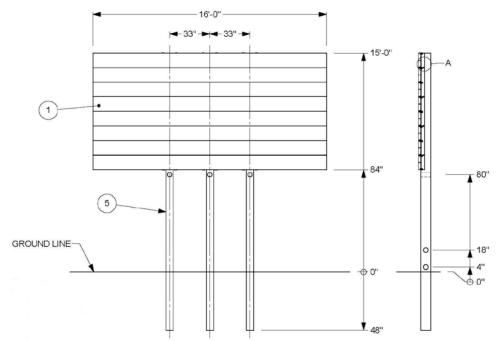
Overall Details of the Direct Embedded Wood Support Temporary Guide Sign System.
